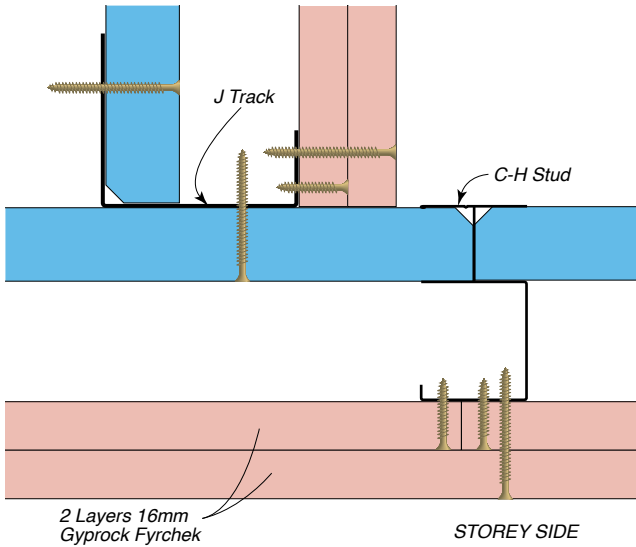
Wall Junction – J-Track With Ibs™ Rod – Plan
